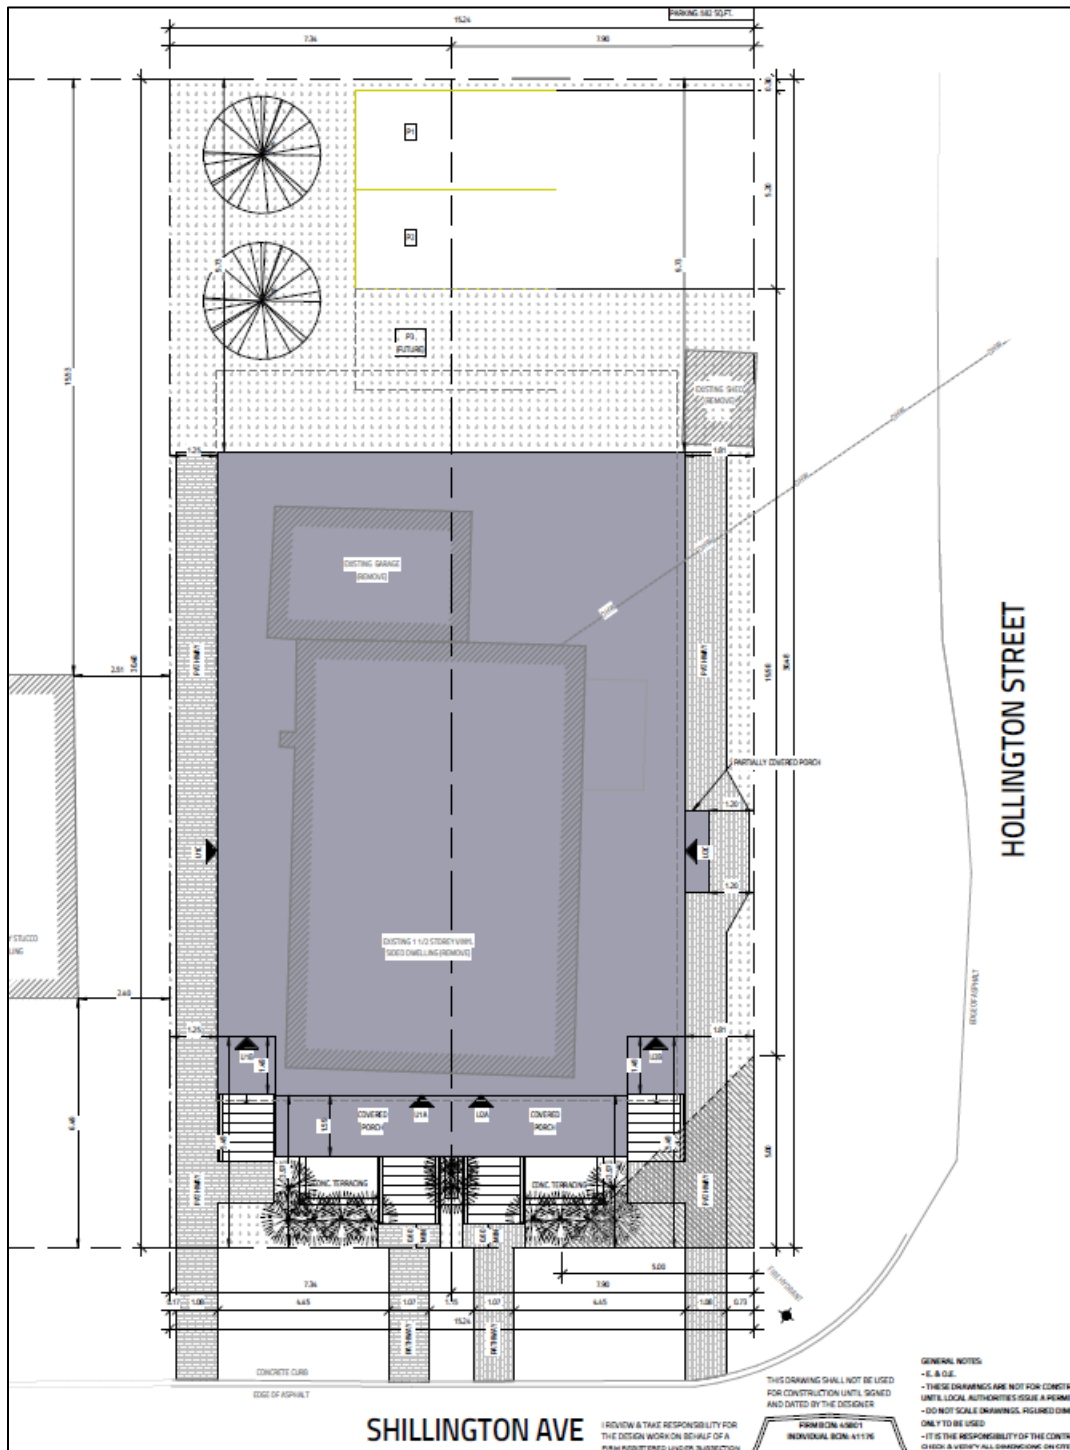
proposed Site Plan for 1231 Shillington Avenue
